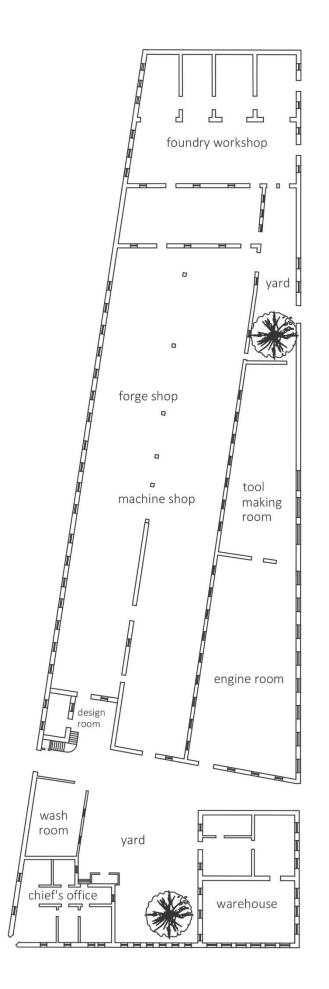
Ground Floor Plan (Phase 1) Source: M. Dimitriou 2019
